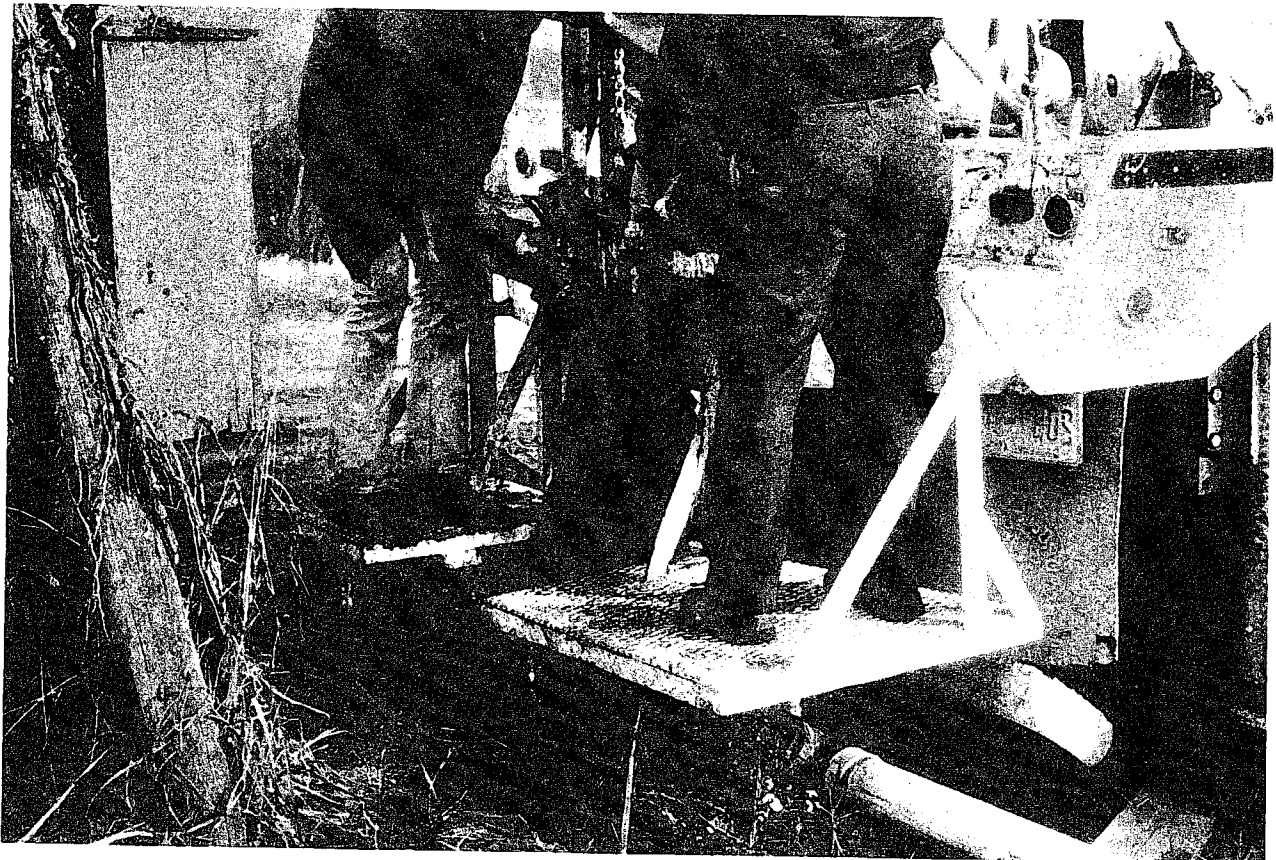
Drillers Inserting the Fabricated Plug Down the Well
